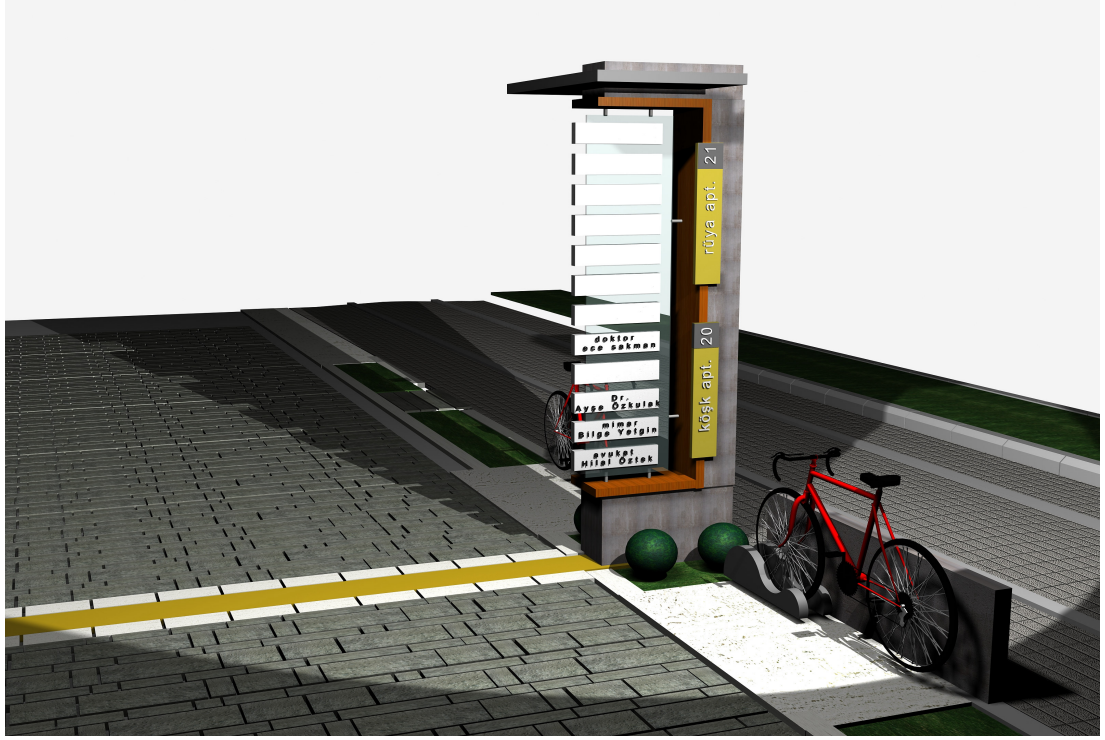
3D Drawing of the Totem adjacent to tram way.
